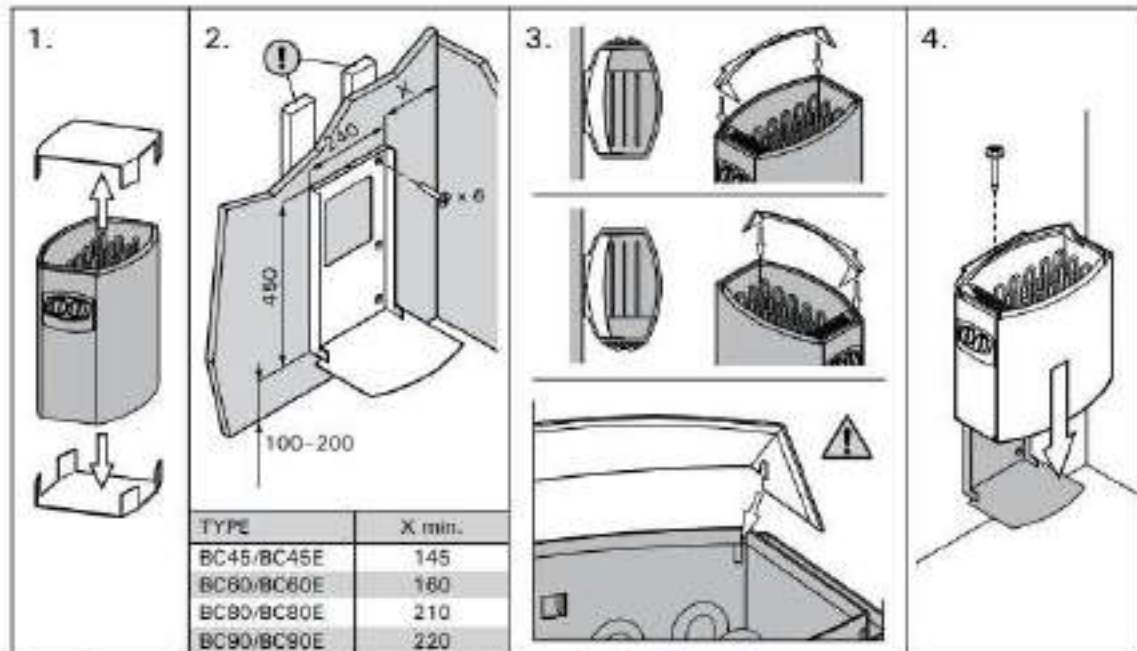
Fastening the heater on a wall (all dimensions in millimeters)
